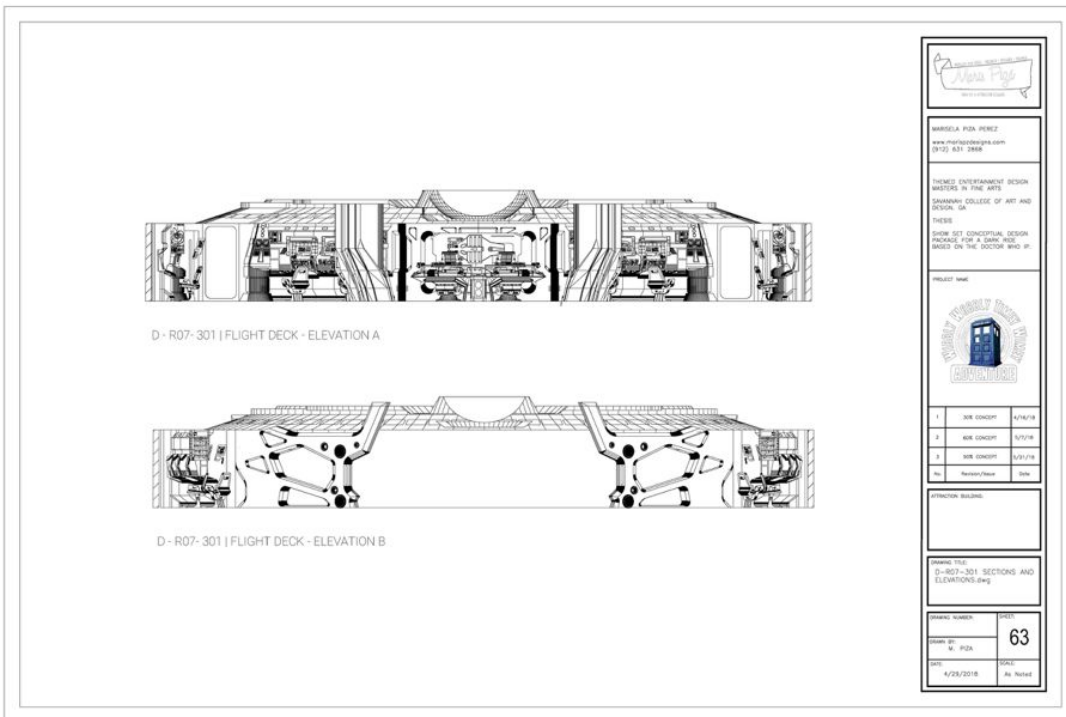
D-R07-301 | Flight Deck - Sections and Elevations
